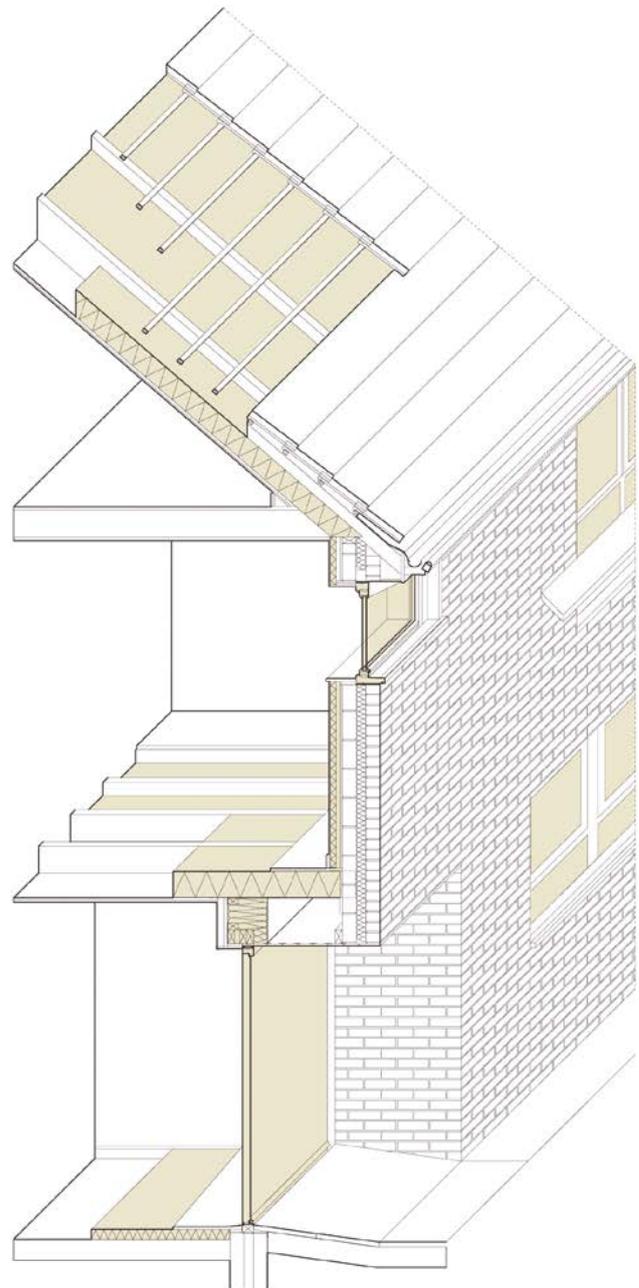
Detailed section post retrofit, from: Baeli, M., 2013, Residential Retrofit: Twenty Case Studies. RIBA Publishing, London^{6.1}
